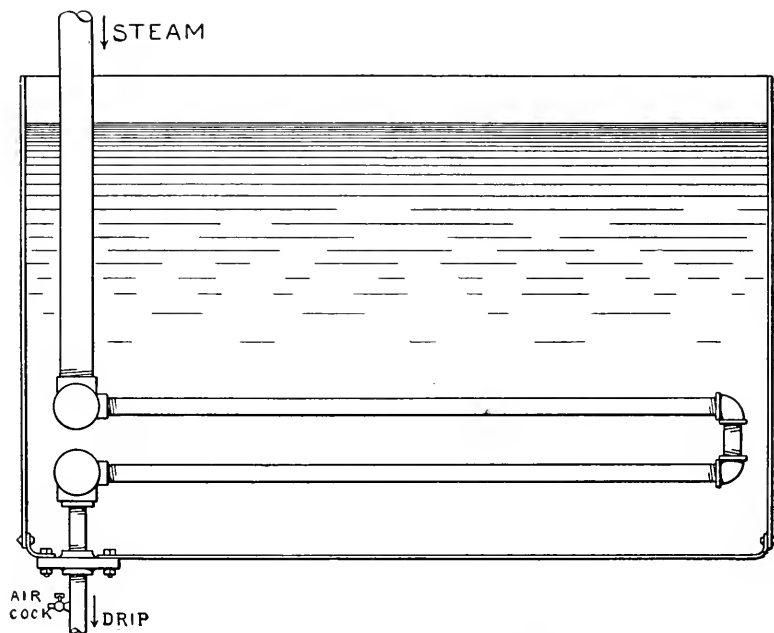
SIDE VIEW OF COIL WITH MANIFOLDS.
